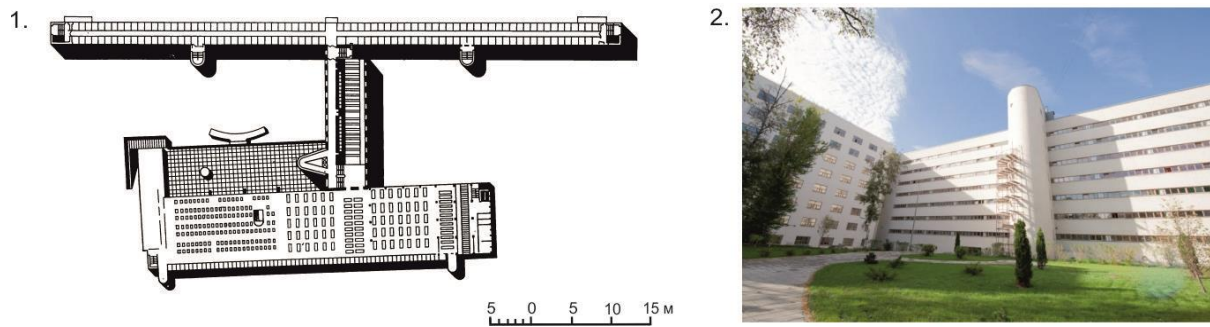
Student hostel: 1. Plan. 2. Fragment. [4]
